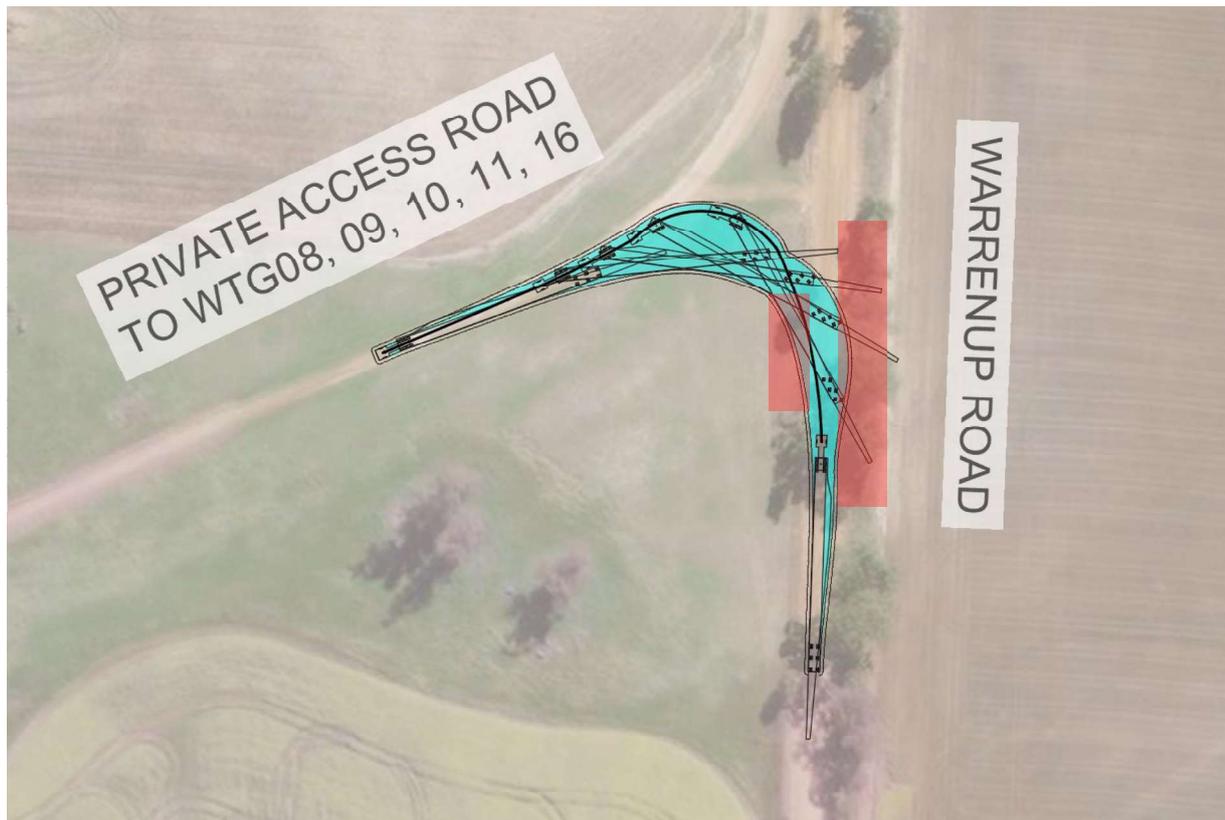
Warrenup Road – Private Access Road (WTG08, 09, 10, 11, 16)
